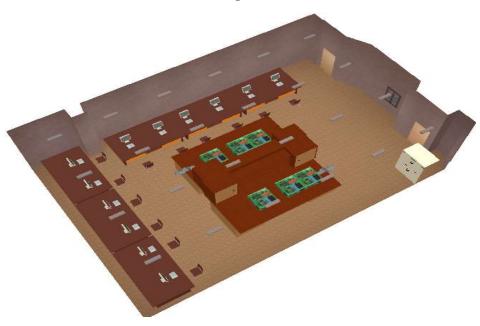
(a): 3D Standard View of VLSI CAD Workshop
